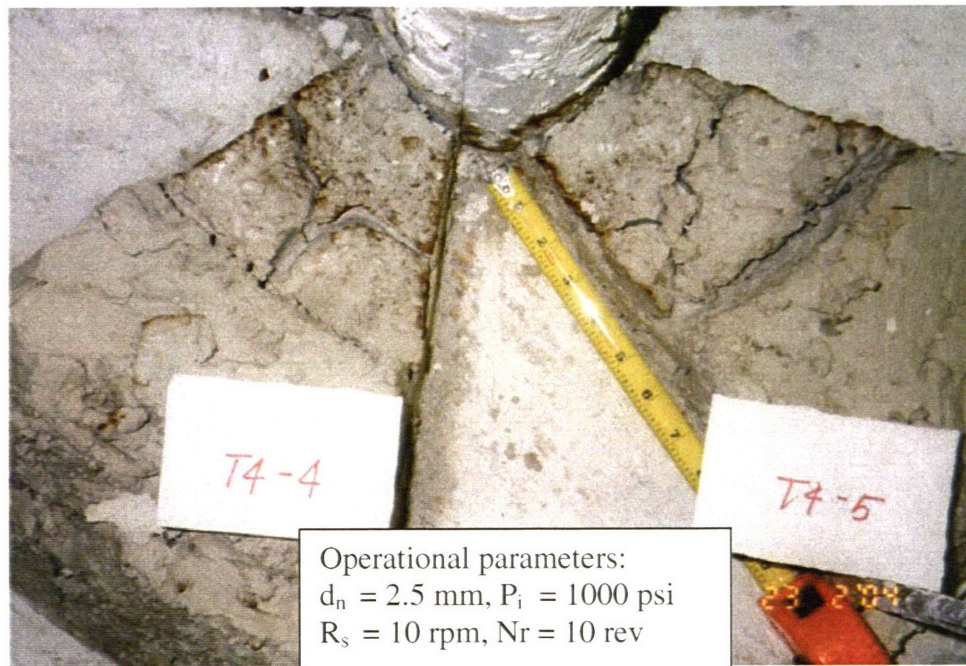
(i). View of exposed vertical soil face (Specimen T4, Section 8)
